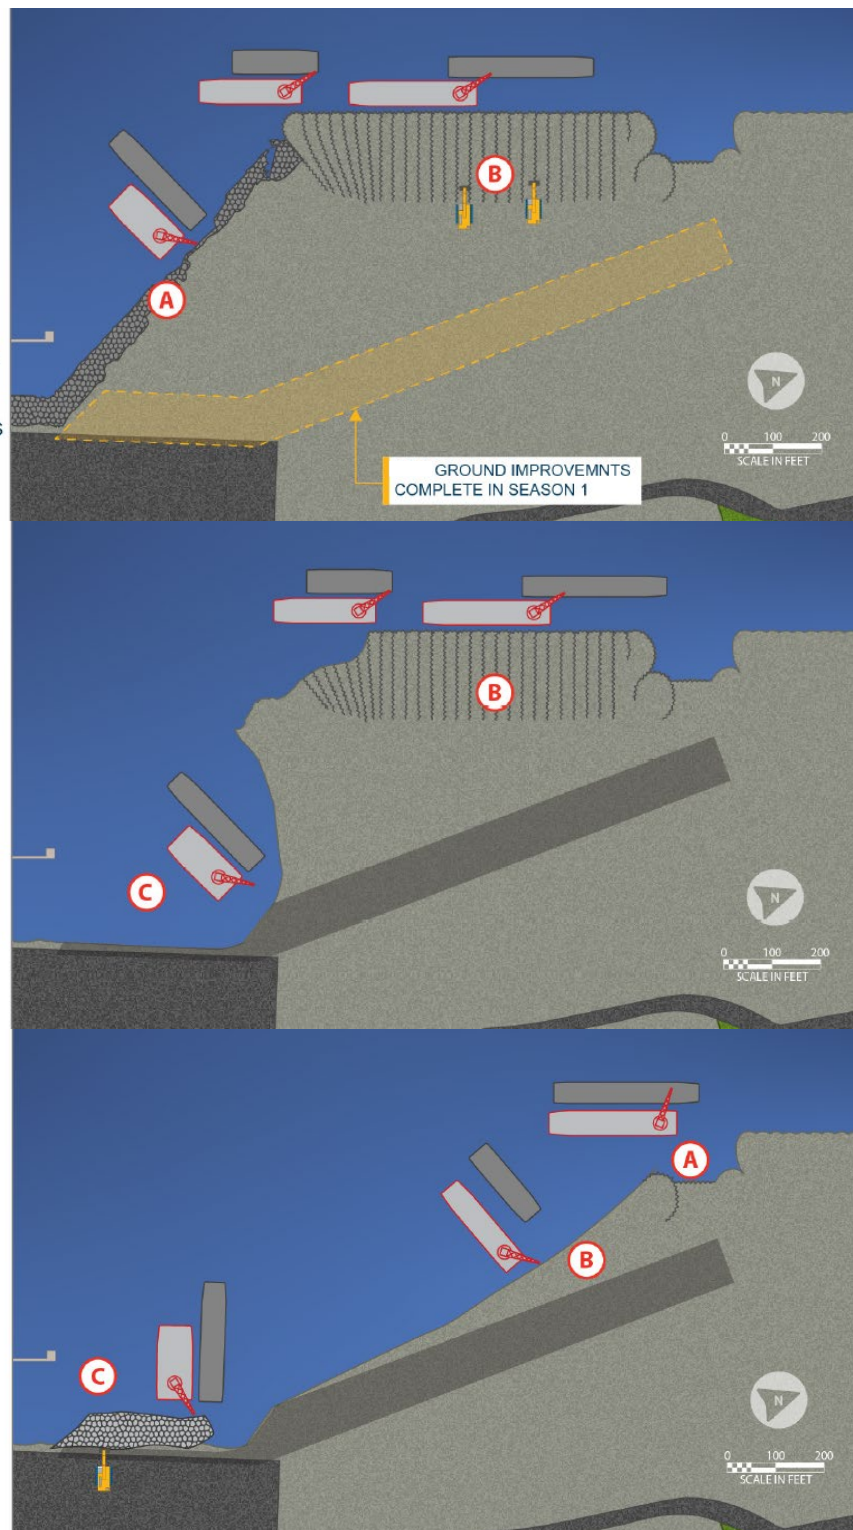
Example of the Contractor's Proposed Demolition Plan (Source: Manson Construction Company [Manson])
